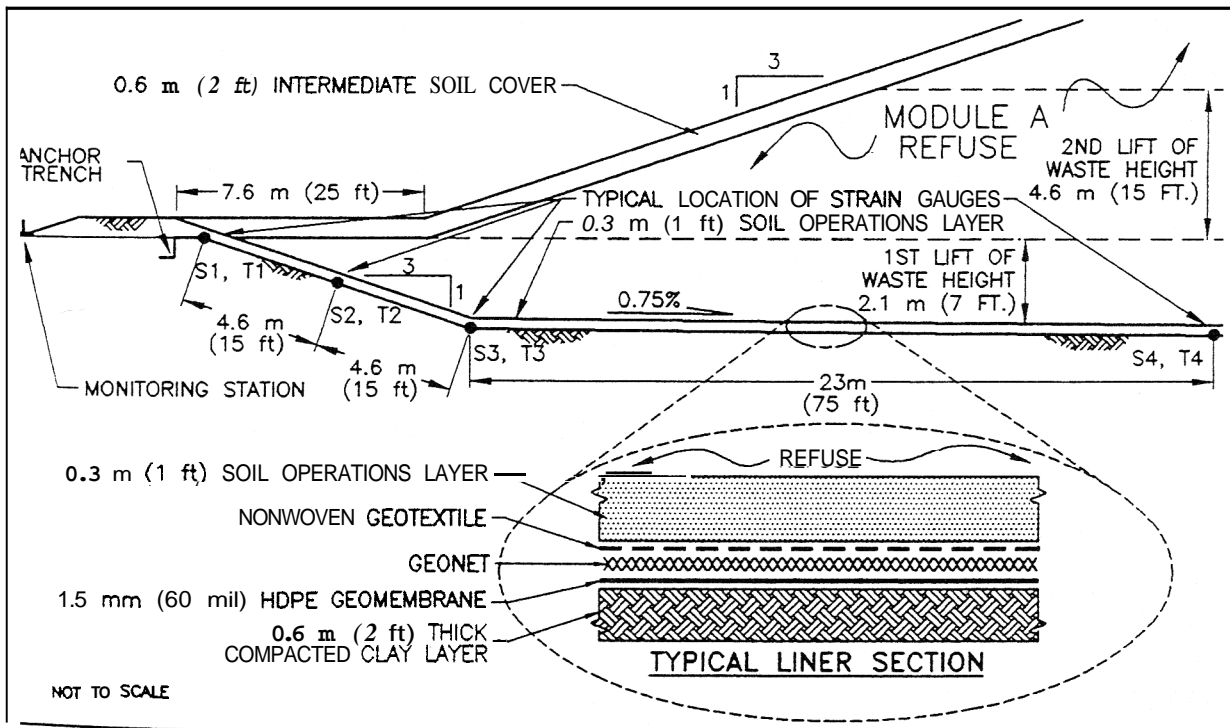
Typical Cross-Section of the Instrumented Landfill Liner System.
